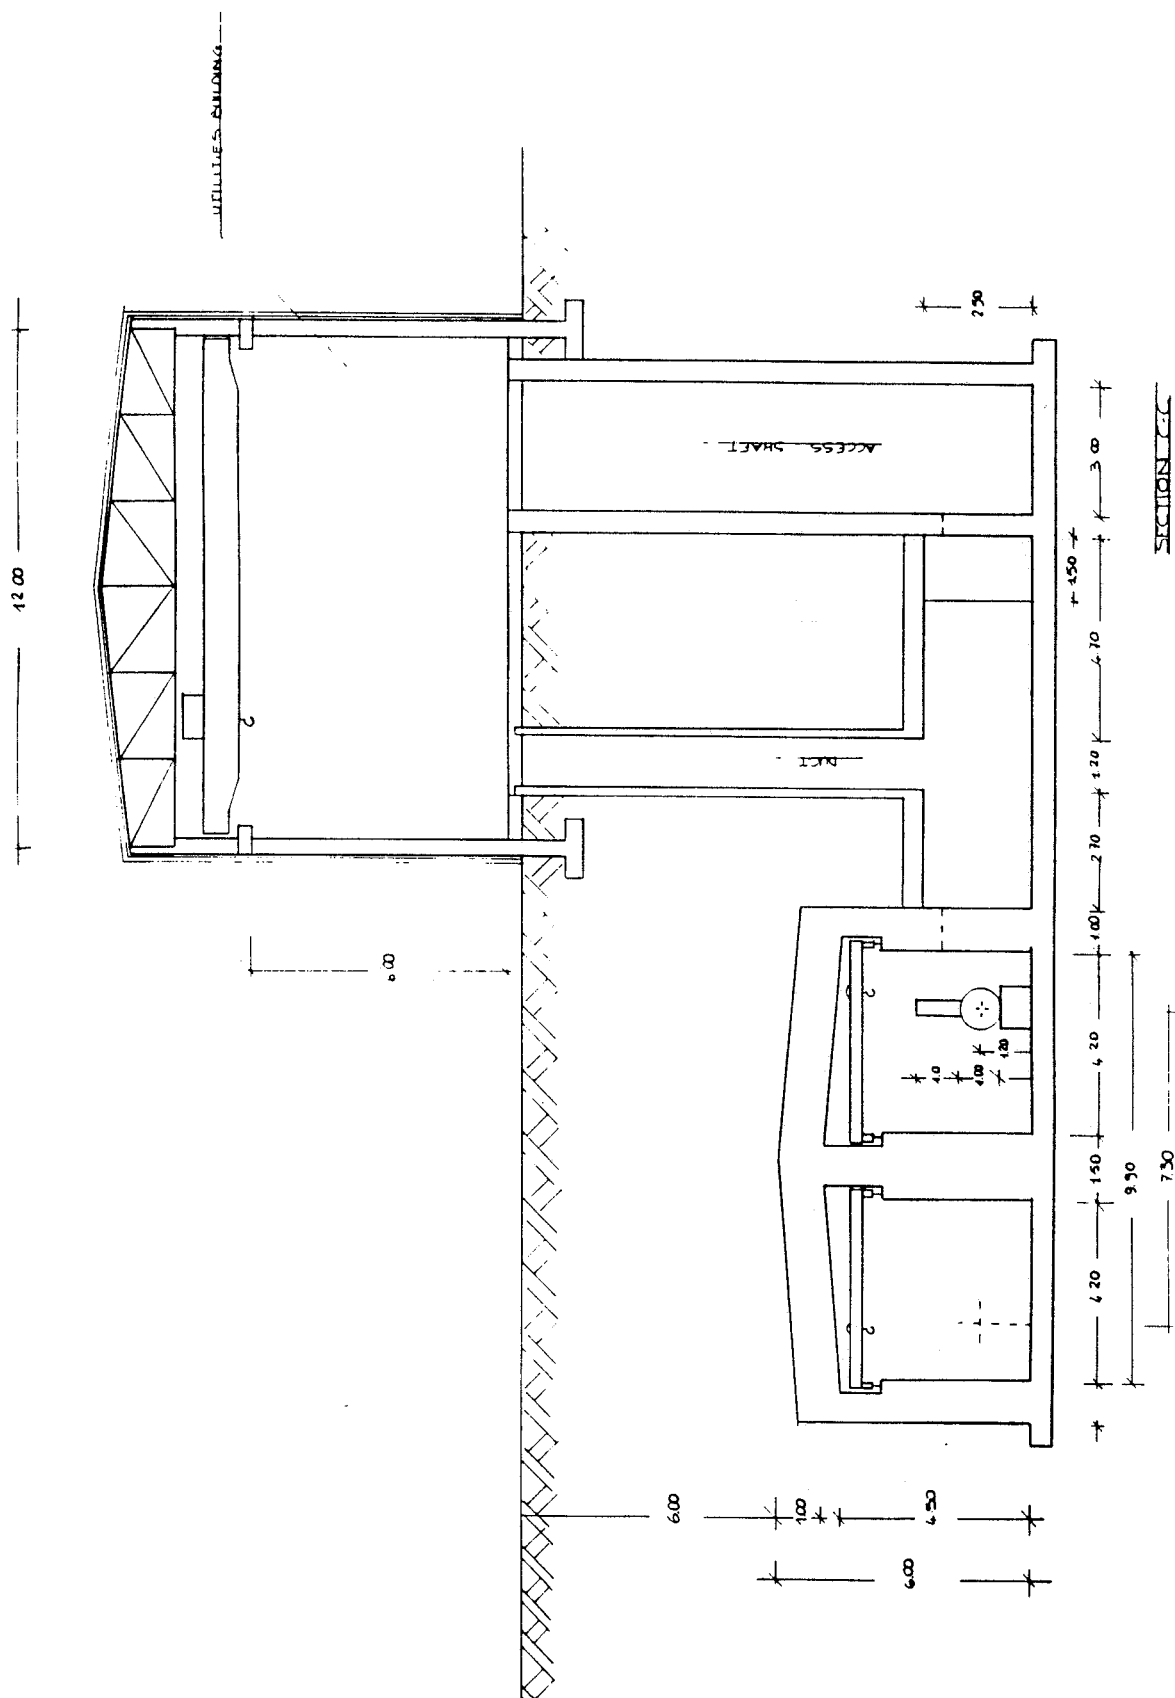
Connection between service and Linac buildings by an internal stair with an adjacent goods lift.
